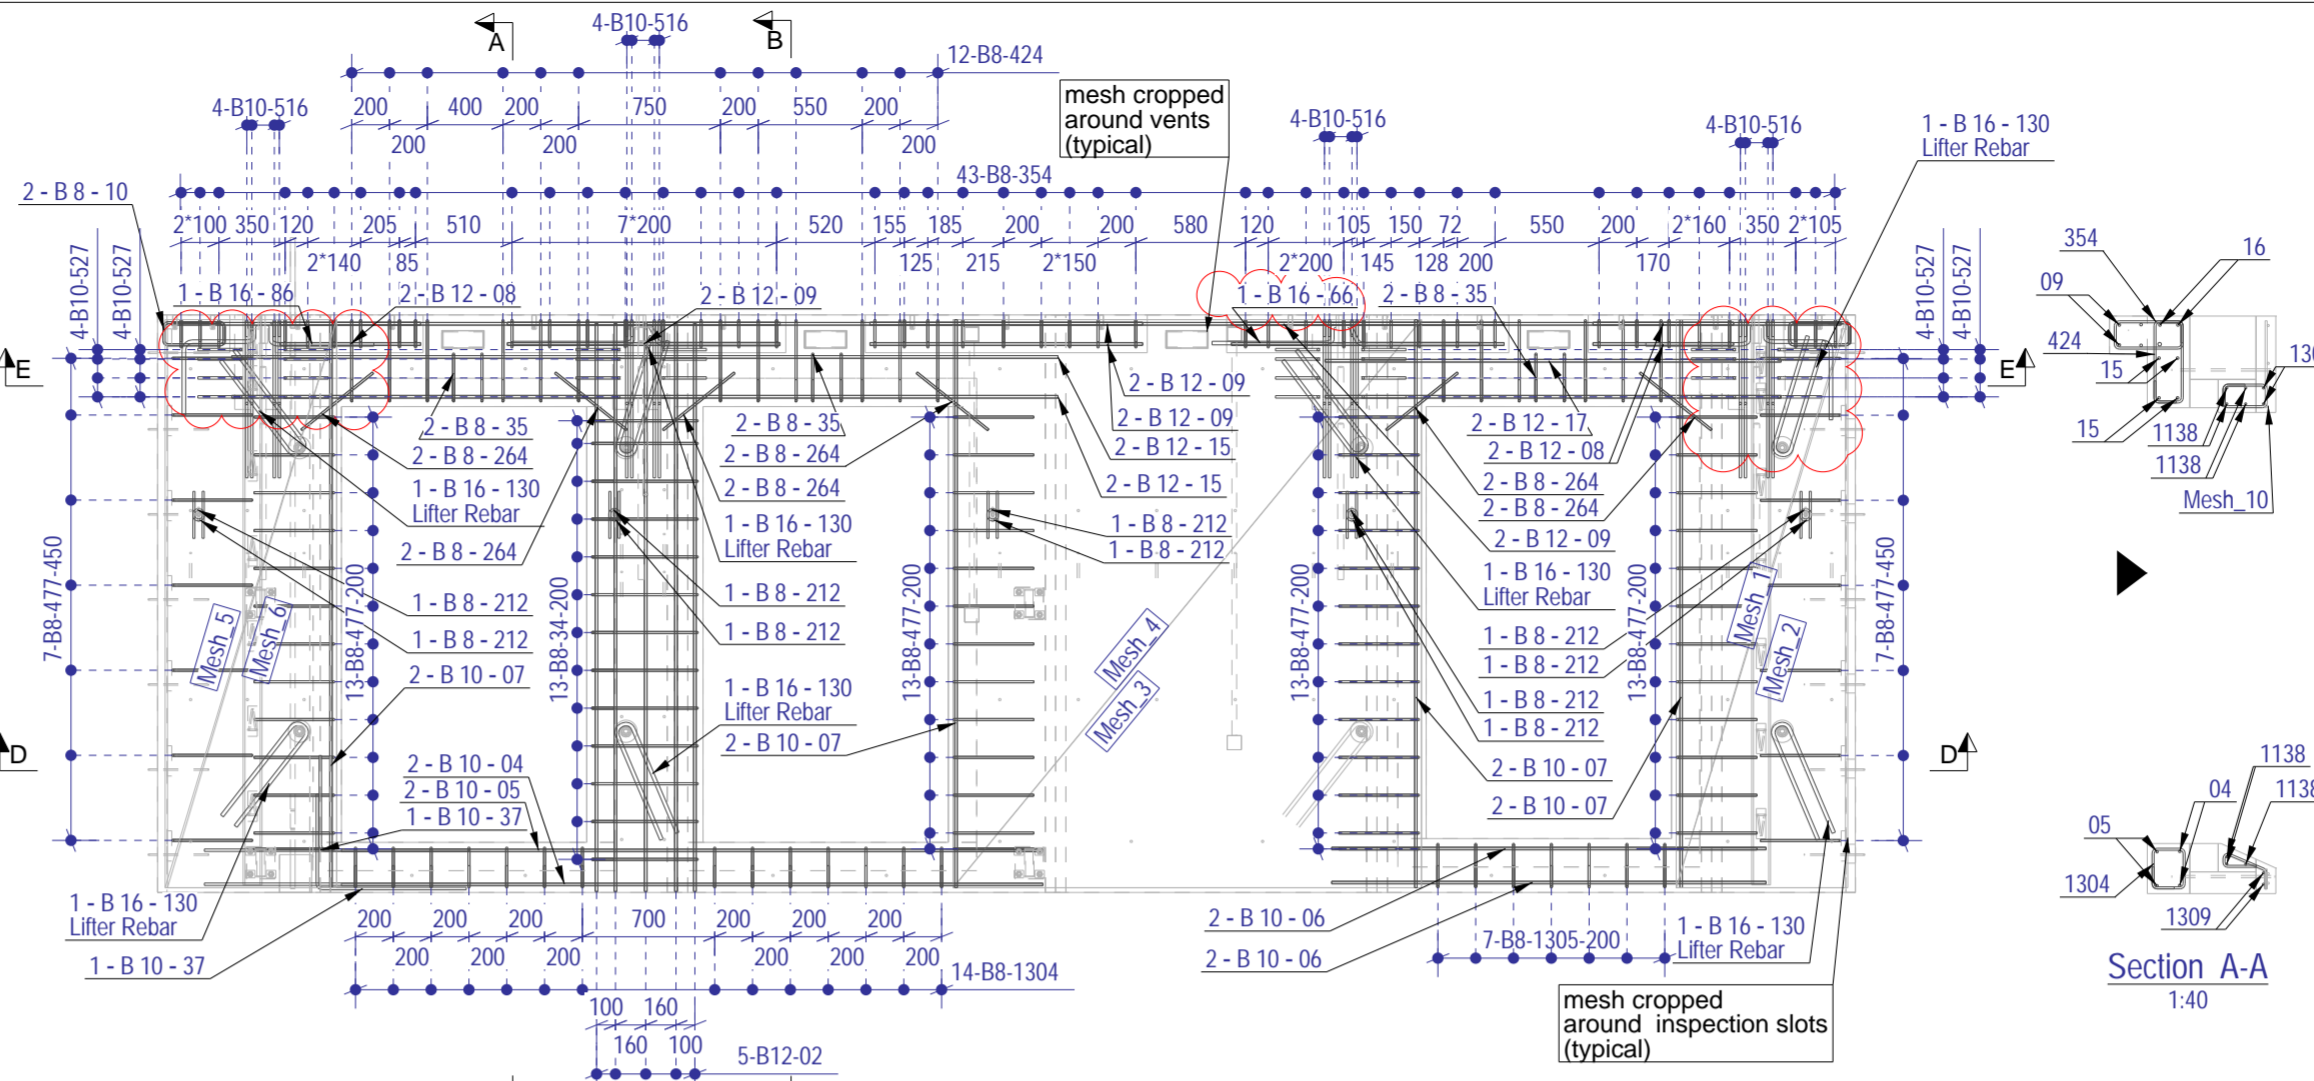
GRA-0058-IP-3010-INS      Rev: C03
